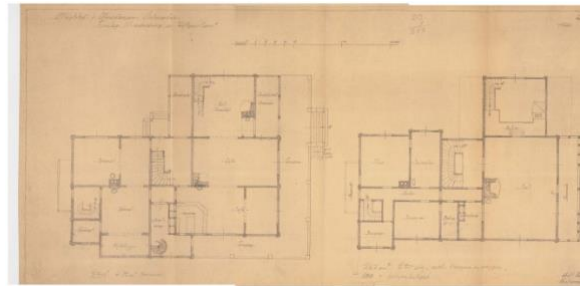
A floor plan exists, but this is dated 1922 (after the building was torn down.)
